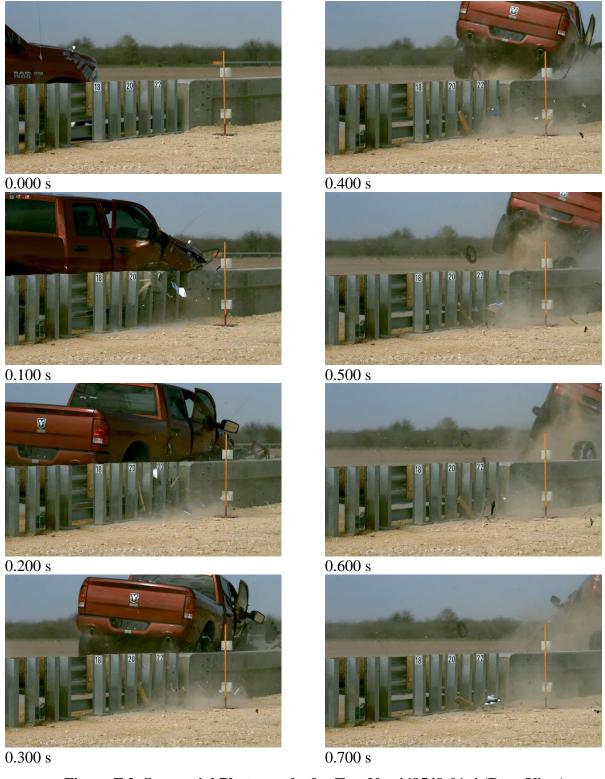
Sequential Photographs for Test No. 469549-01-4 (Rear View).
